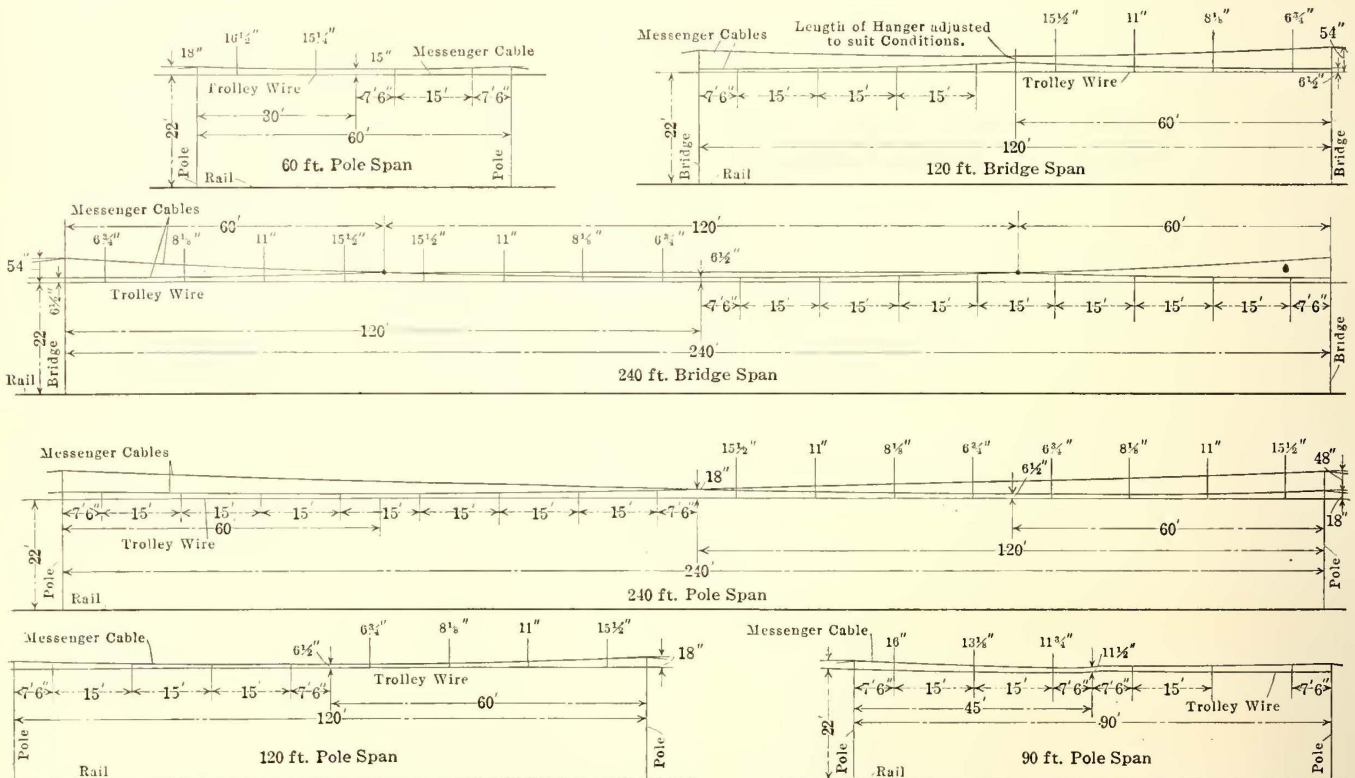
Southern Pacific 1200-Volt Lines—Typical Catenary Spans and Hanger Spacings
